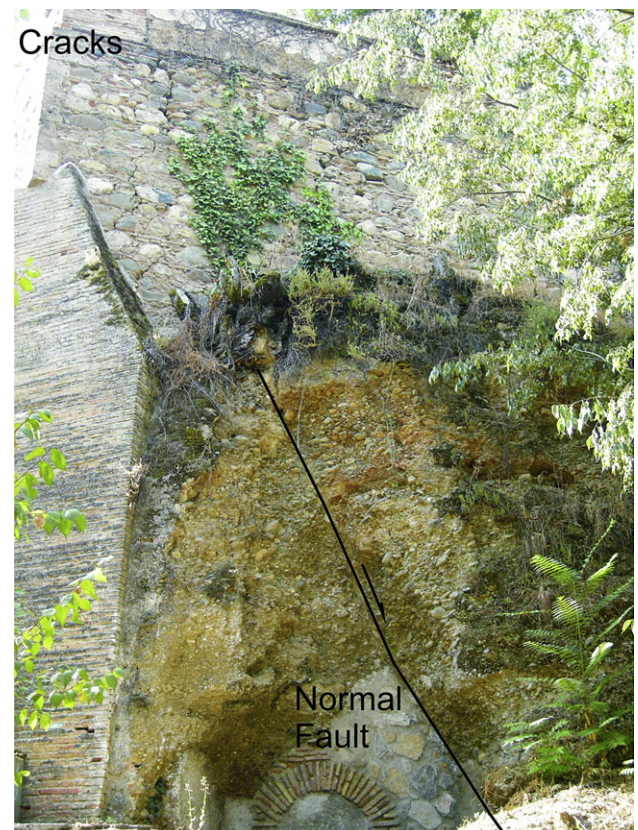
Crack on the Alhambra wall above a fault.
